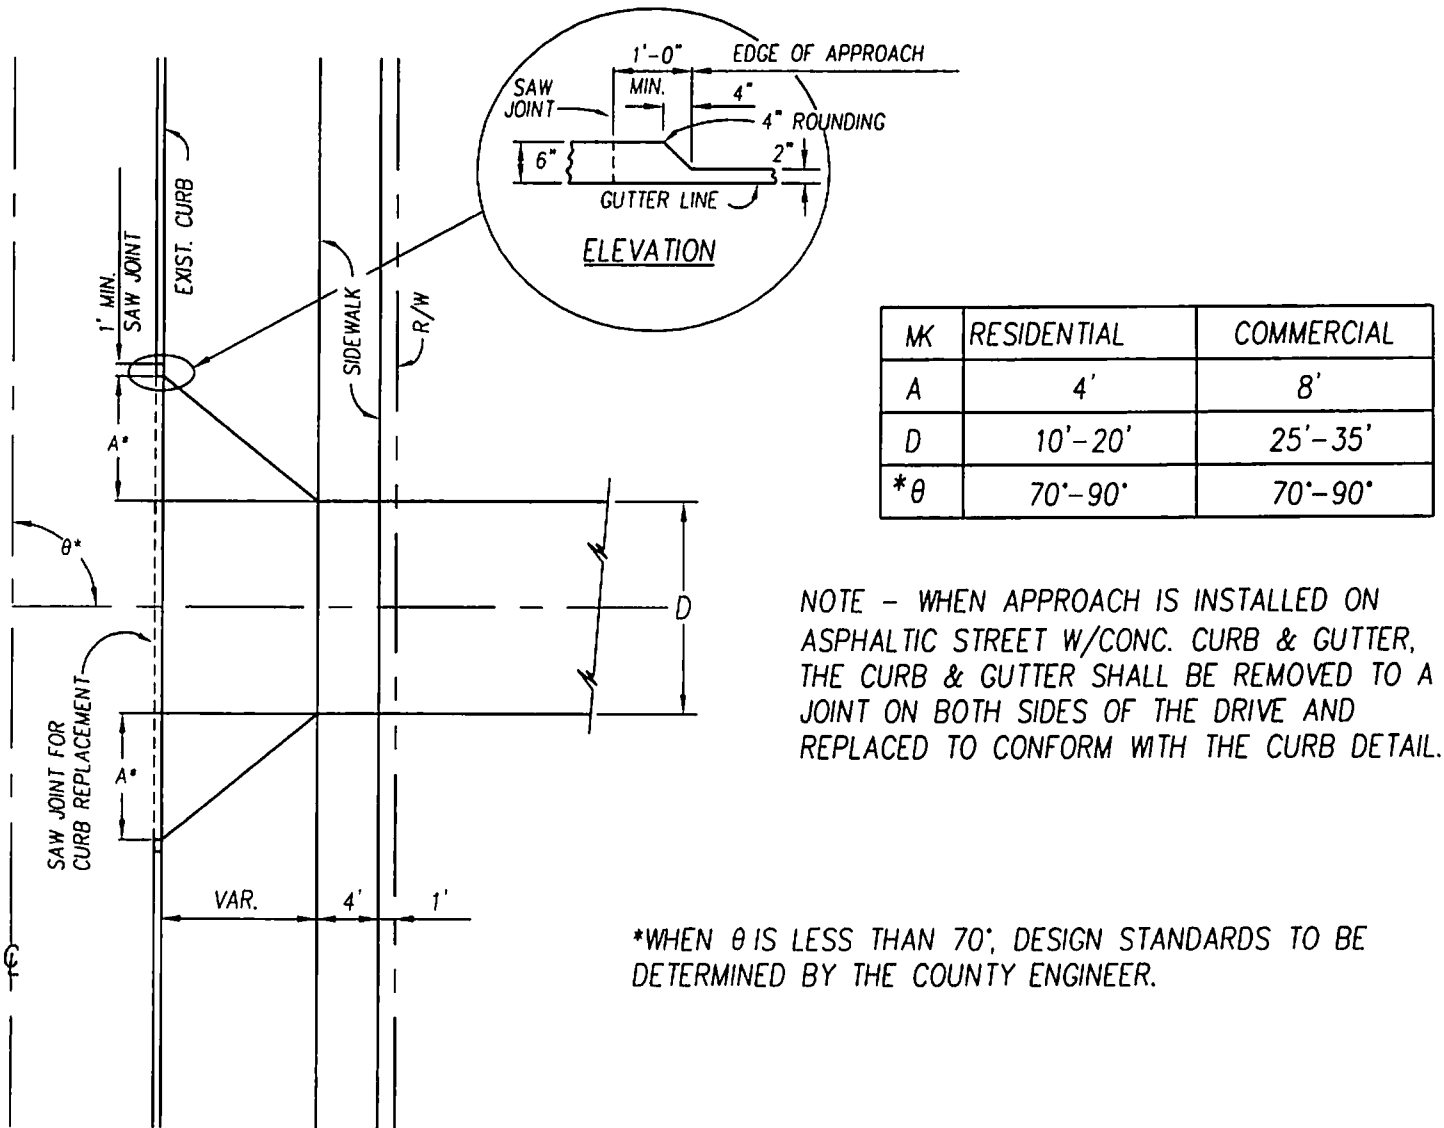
Approach Plan for Driveway with Curb and Gutter
